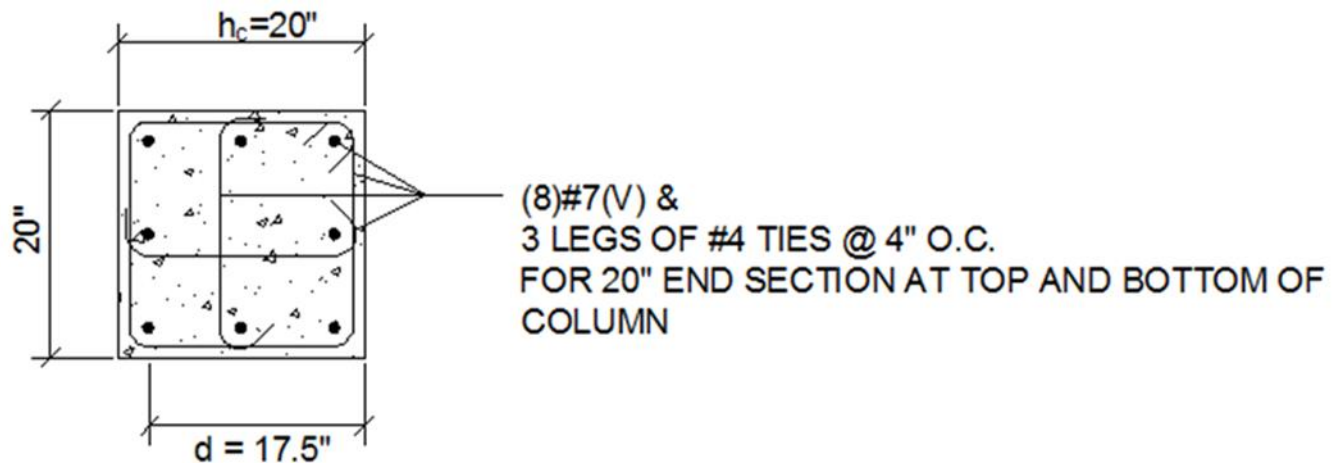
Interior column, cross-section end of column at all floor levels based on SDC D design.
